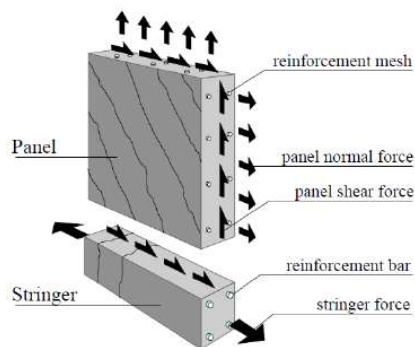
The dividing of the structure using the stringer-panel method and acting forces [11]
